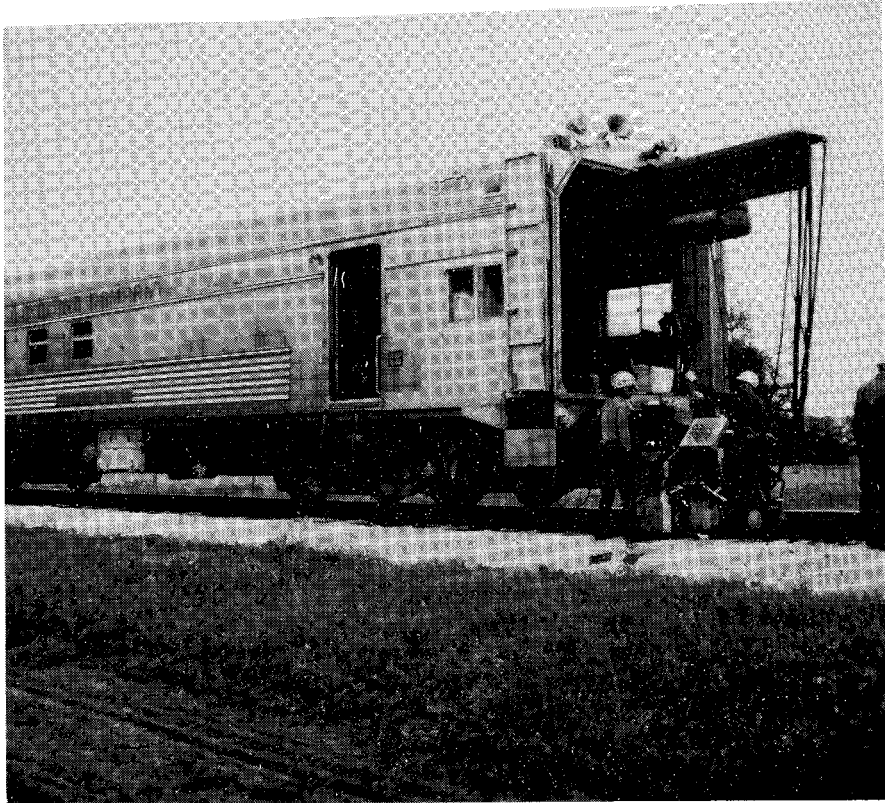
RAIL WELDING CAR WITH IN-TRACK FLASH WELDER SET ON RAIL JOINT
